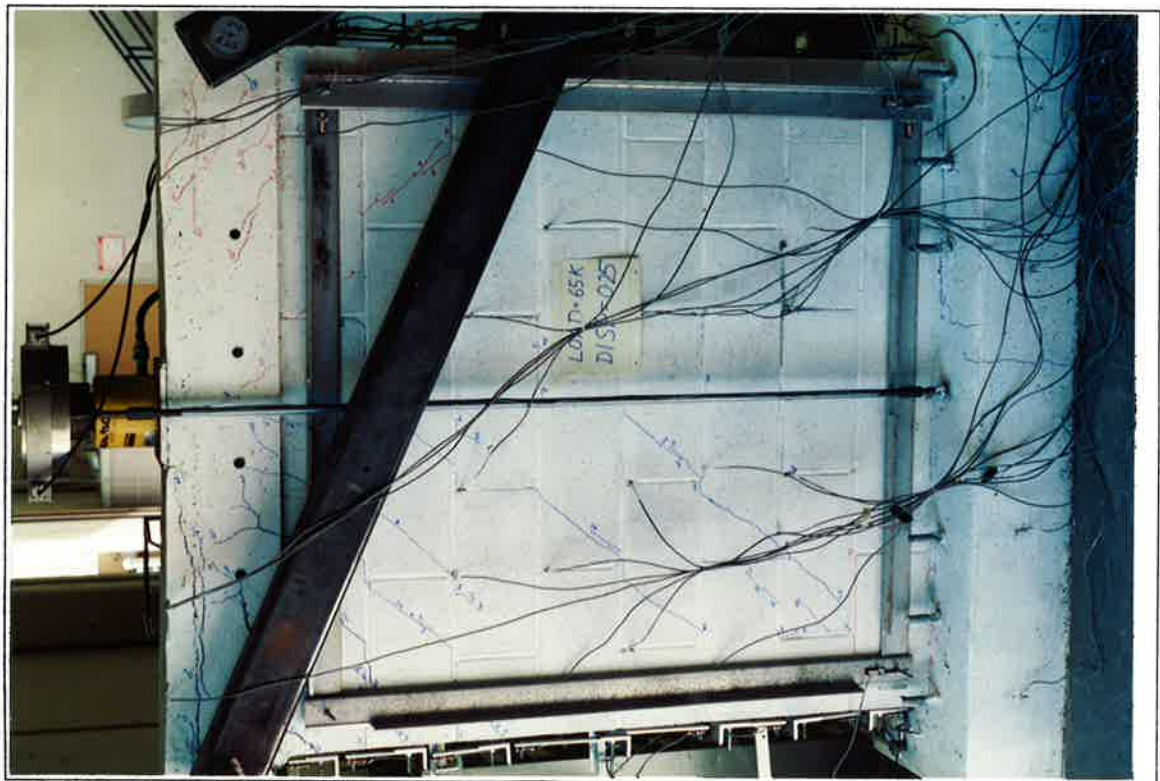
Monolithic Wall At 289 kN (65 Kips) Lateral Load (South Face)
